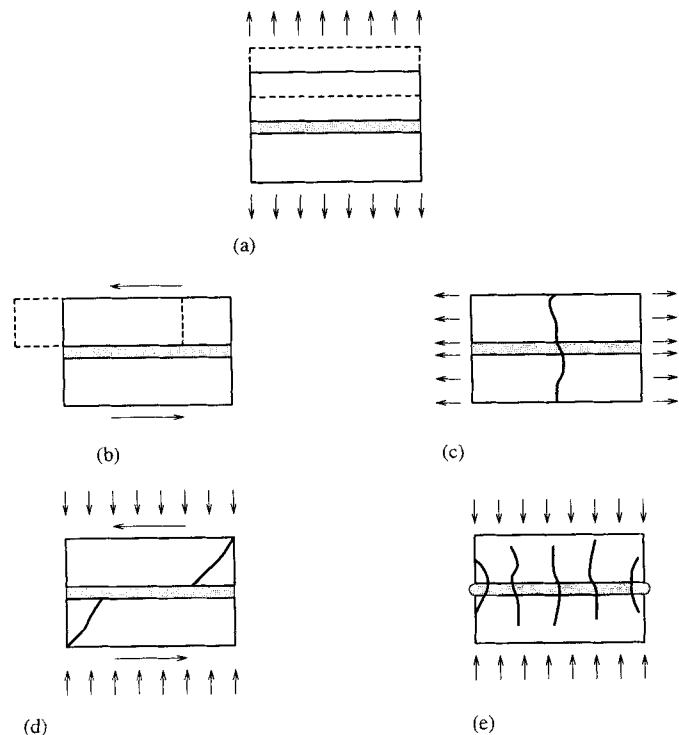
Failure Mechanisms of Masonry: (a) Joint Tension Cracking; (b) Joint Slip; (c) Unit Direct Tension Crack; (d) Unit Diagonal Tension Crack; (e) Masonry Crushing
